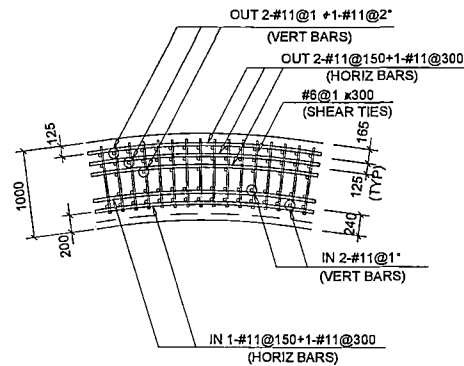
Typical Roofs Rebar Arrangement (unit: mm)
